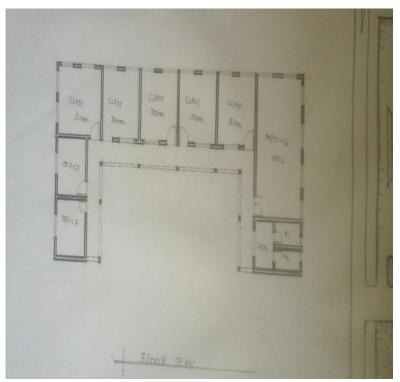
FLOOR PLAN OF CASE STUDY ONE
